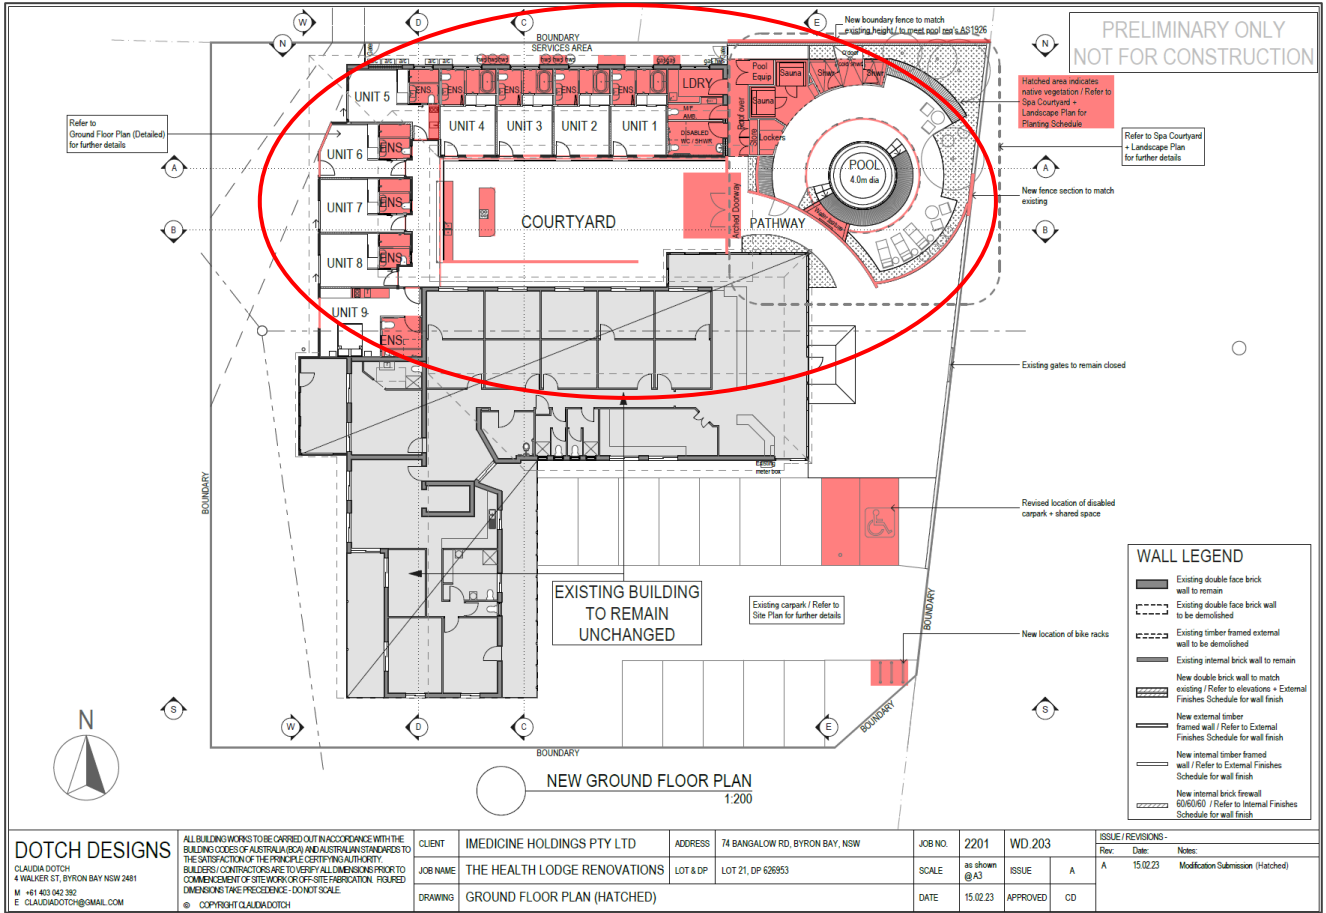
Proposed floor plan with location of proposed development (larger image in Appendix D)
